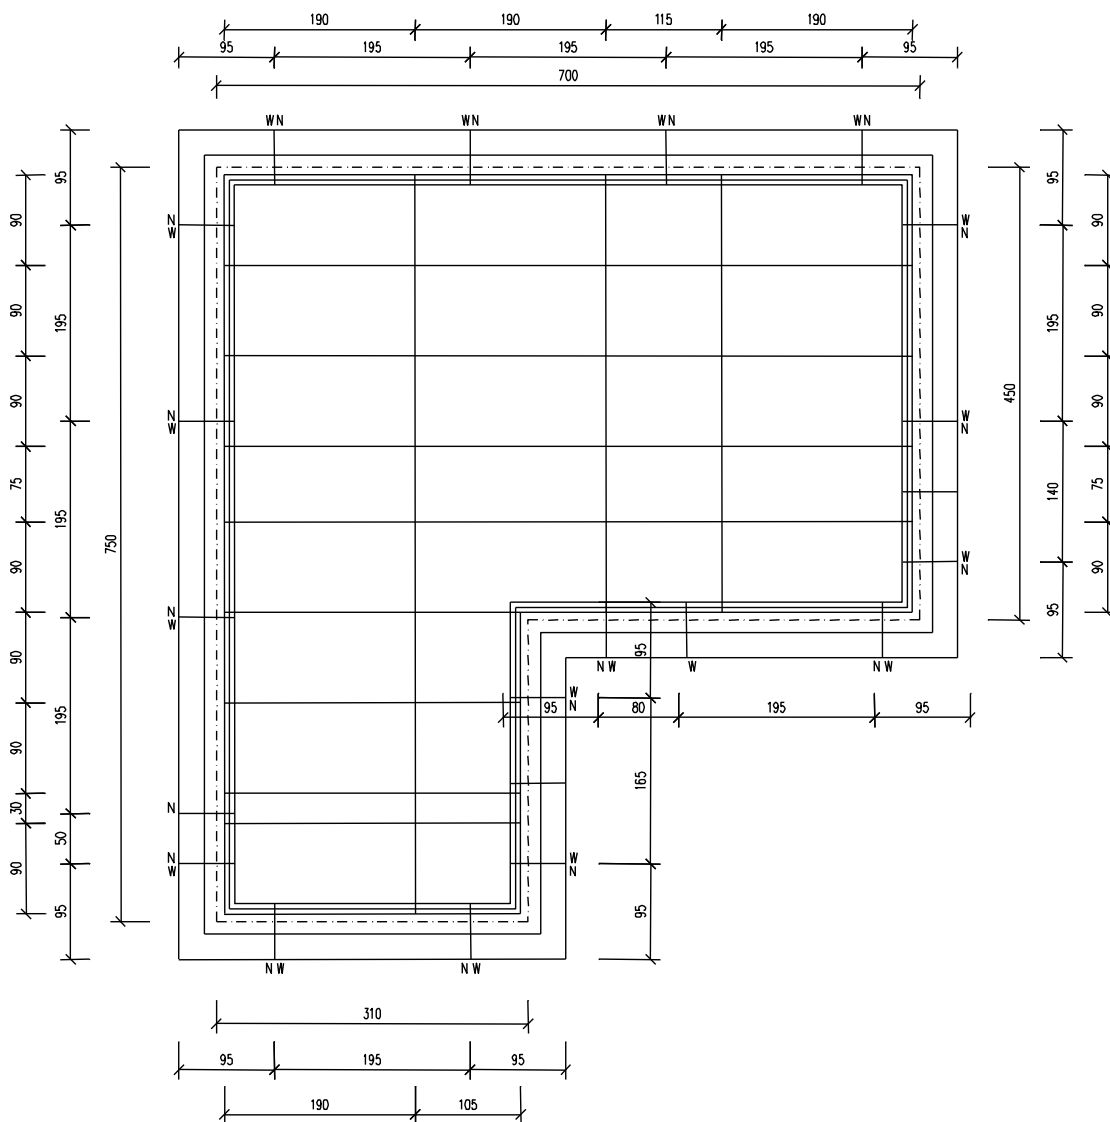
Example of distribution of Styrofoam elements on the building plan
